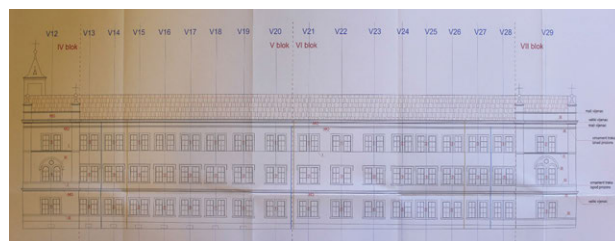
The Convent of Saint Bonaventure, Visoko: elevation view from the southeast, segment of the project for façade reconstruction done by team of authors led by Merima Kapetanović (3N Kuća)
